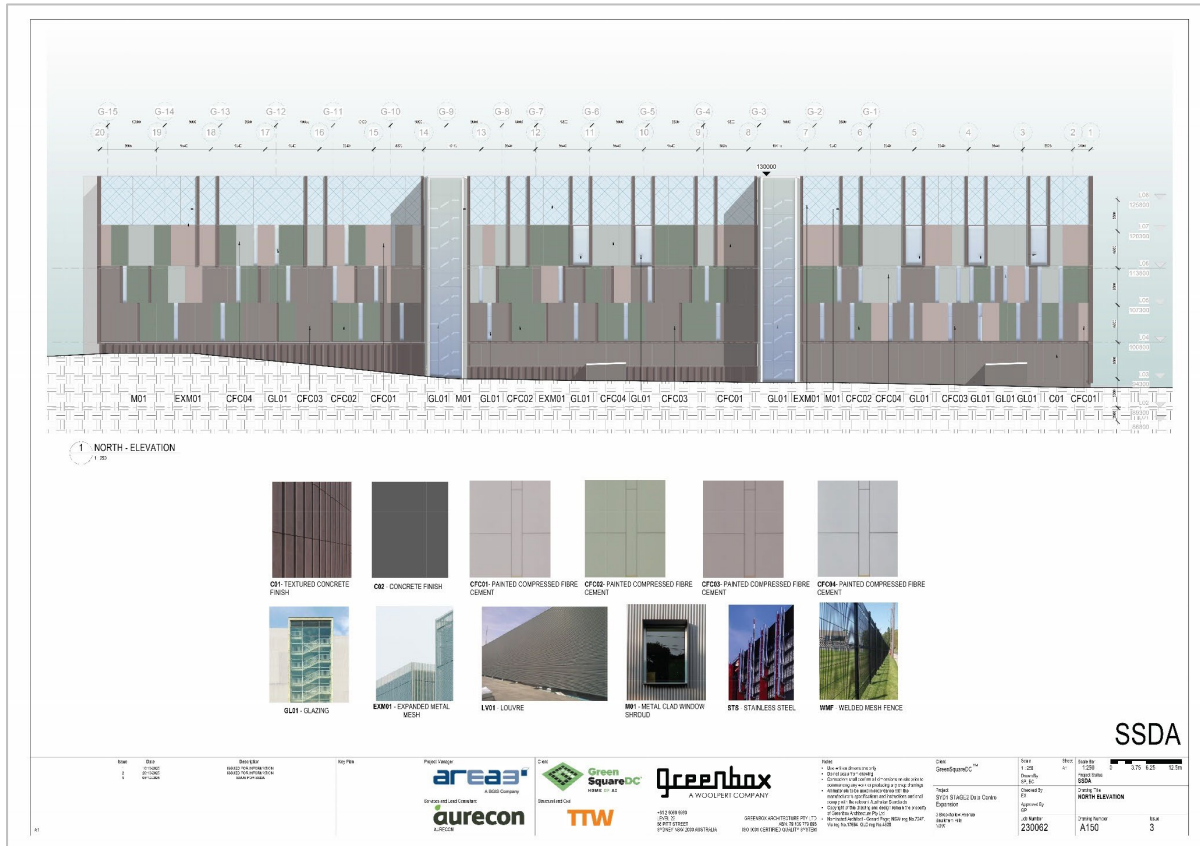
Northern Elevation (Source: Greenbox. 2025).
